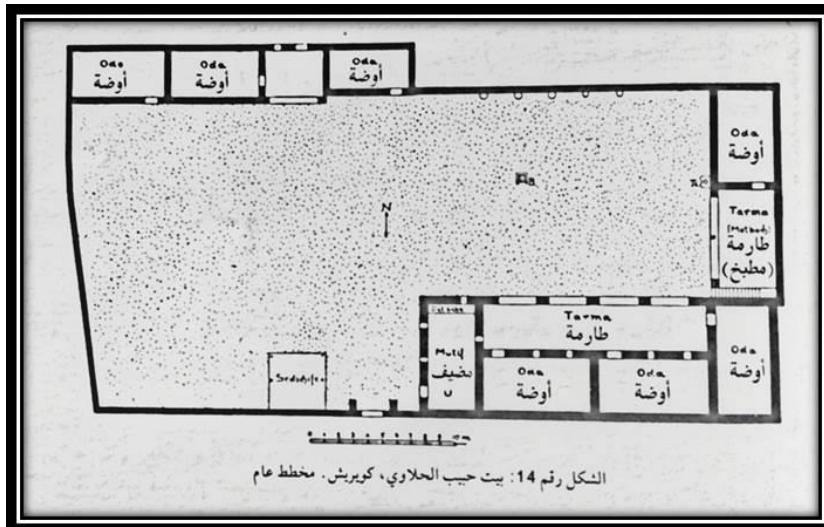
Typical Plans of Rich Farmers, Plan House of Habib Al-Hillawi, Kweresh, in Hilla, Iraq [152].
